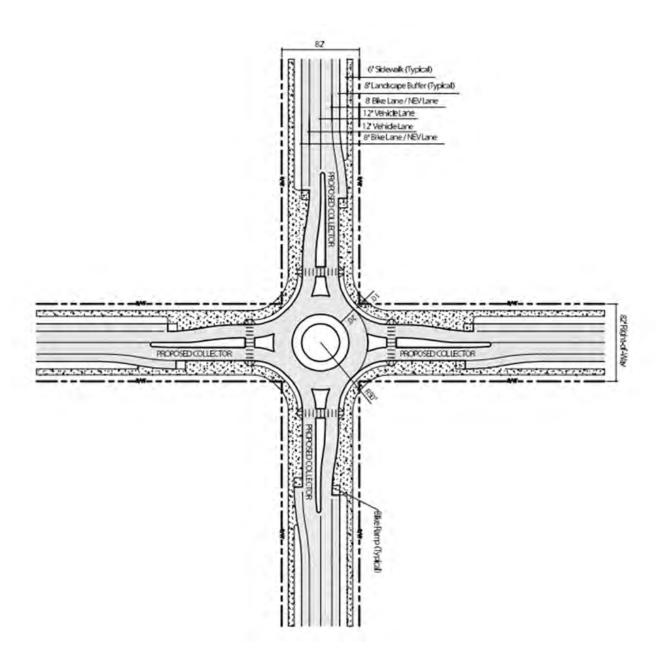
TYPICAL ROUNDABOUT - COLLECTOR TO COLLECTOR
